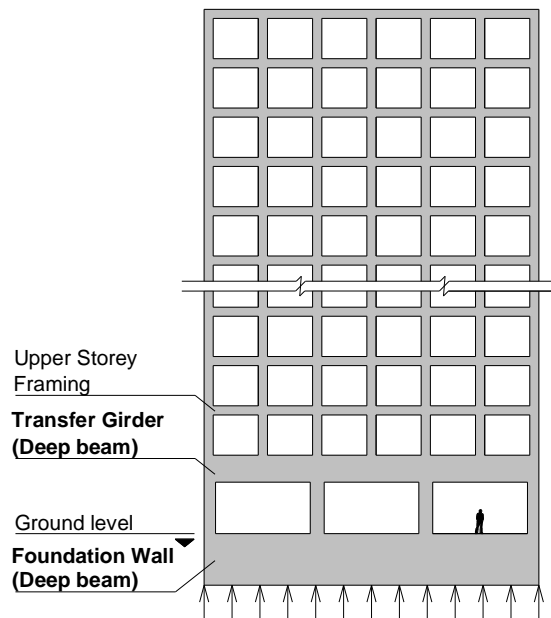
A typical building elevation with deep transfer girders (adapted from Kong, 2006¹)
